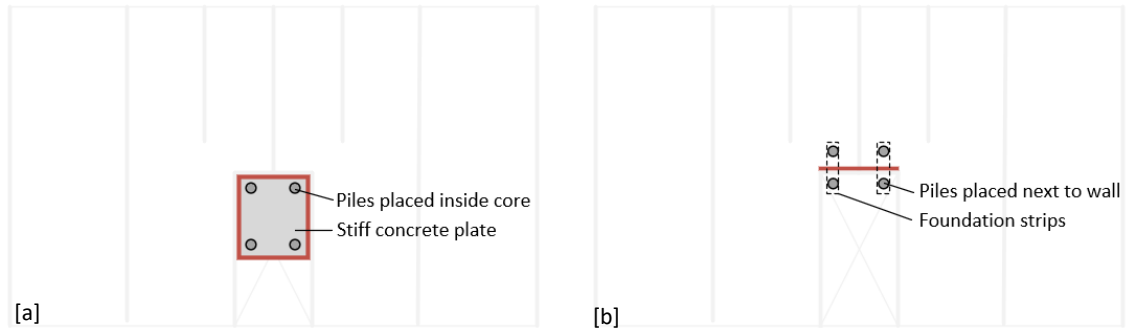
Schematization of pile placement. [a] Core; [b] Wall/Bracings (Self-produced).
